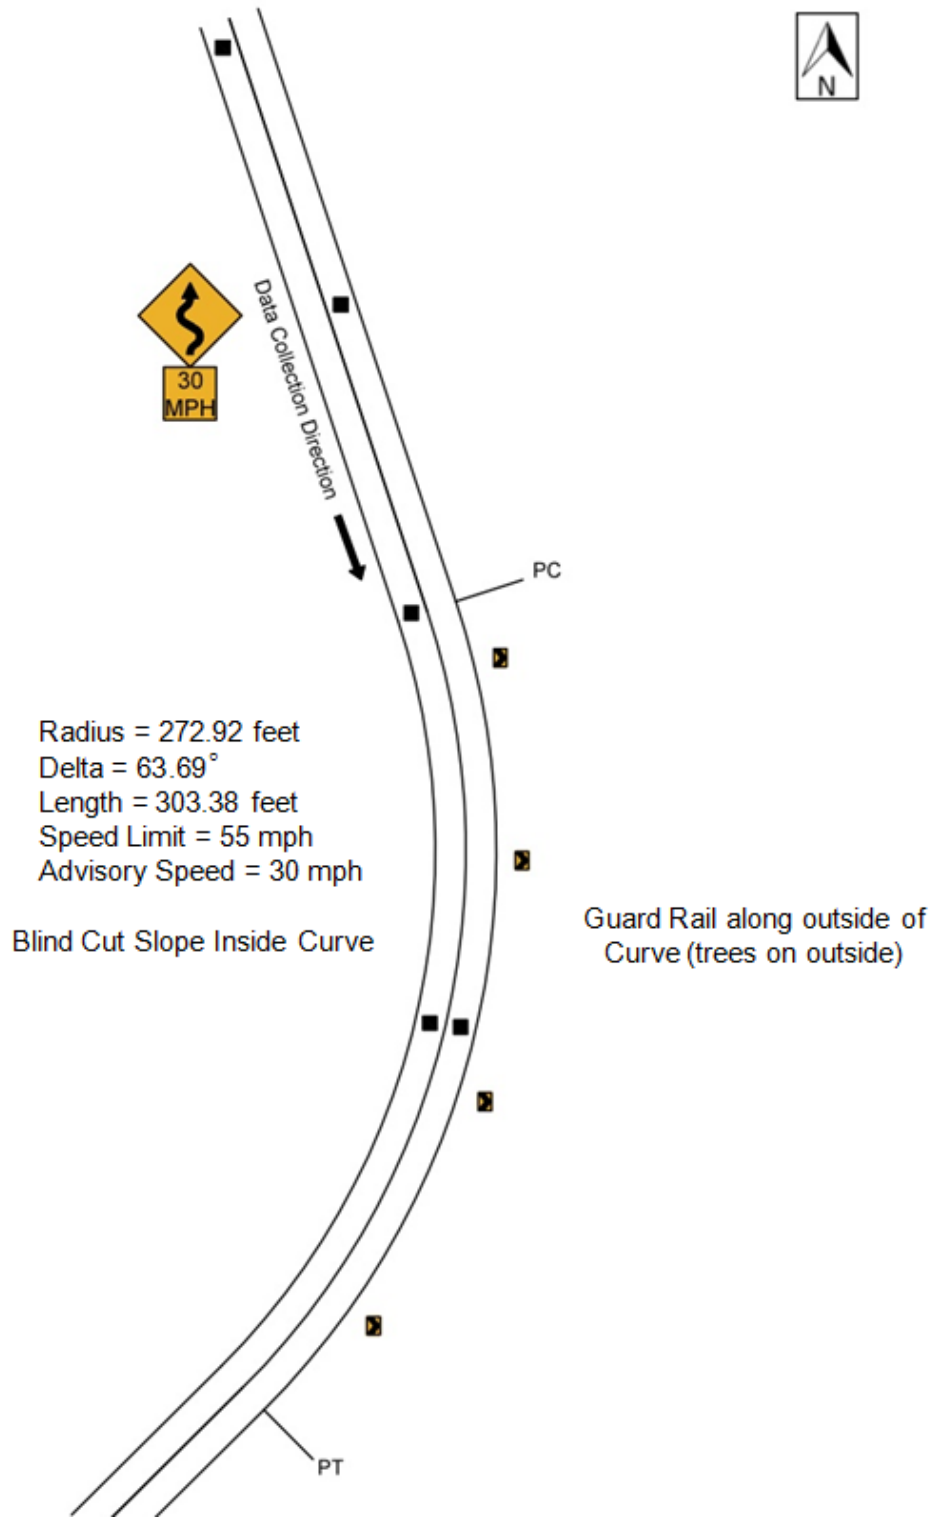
Diagram. Geometric layout of Alabama Location #2 (not to scale).
